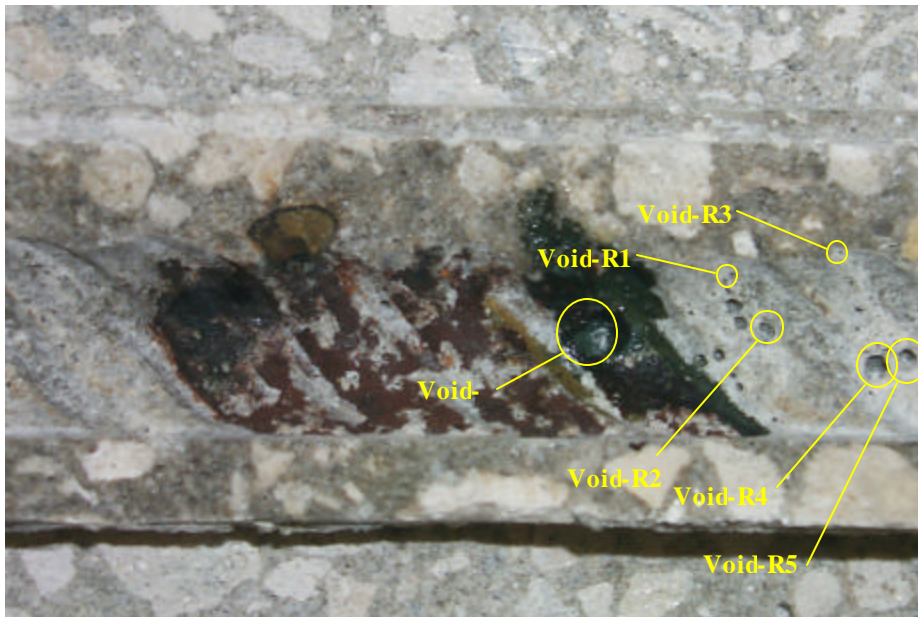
Photograph of the rebar trace from Specimen 10 (HA0.41) showing concrete voids that were compositionally analyzed.
